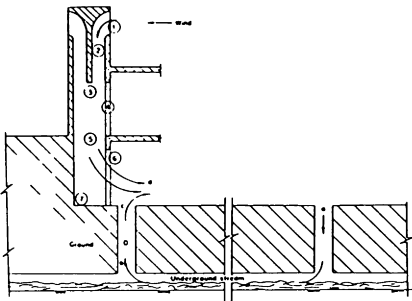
A cross section of a wind tower in conjunction with an underground water stream. (2)
